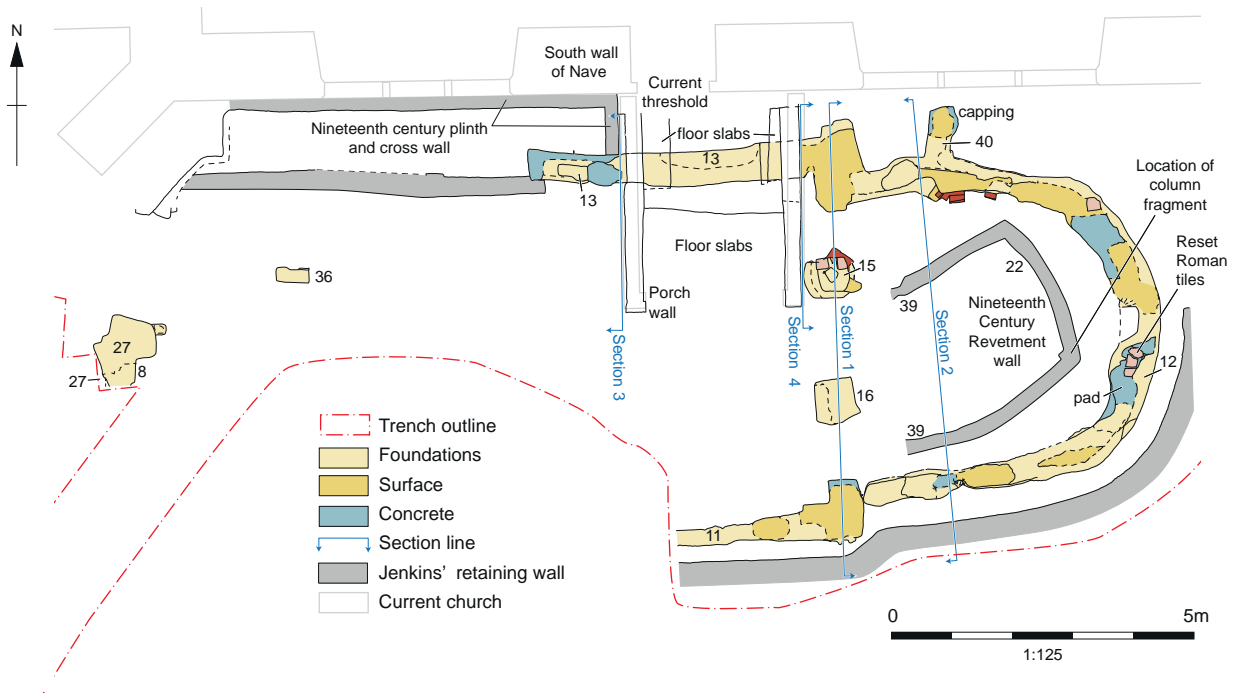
Plan of apse showing location nineteenth-century retaining wall. *Image:* authors.
